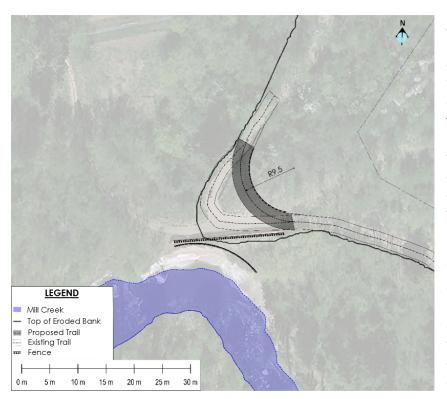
Site 2 - Option 1: Local Trail Realignment – Short Wall
